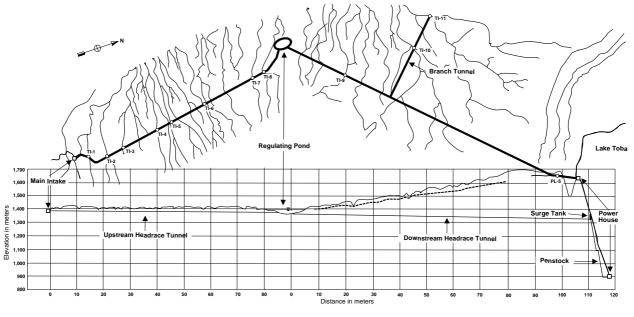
Plan View and Cross Section View of Renun Hydro Power Plant Project
